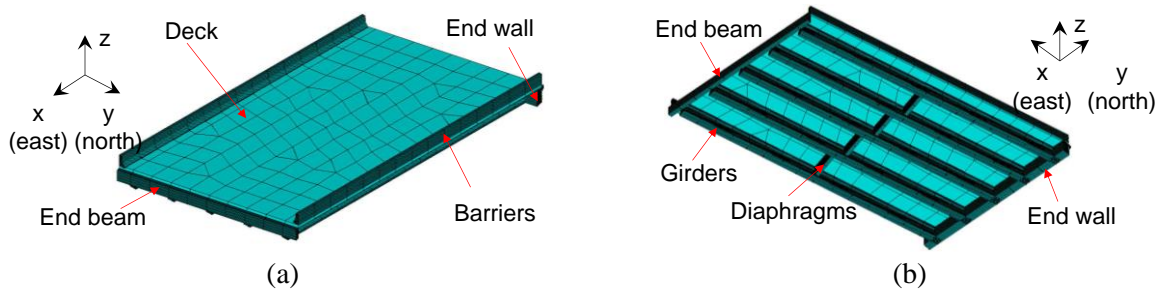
Finite element model built in ANSYS: (a) top view; (b) bottom view
